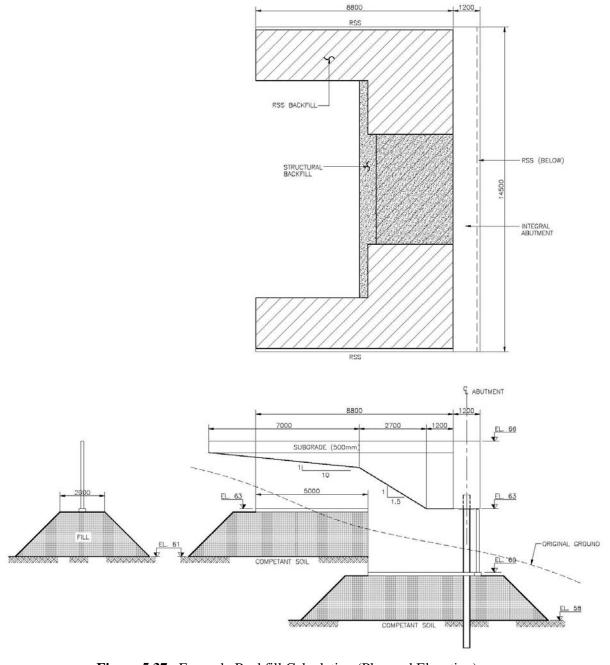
Example Backfill Calculation (Plan and Elevation).
